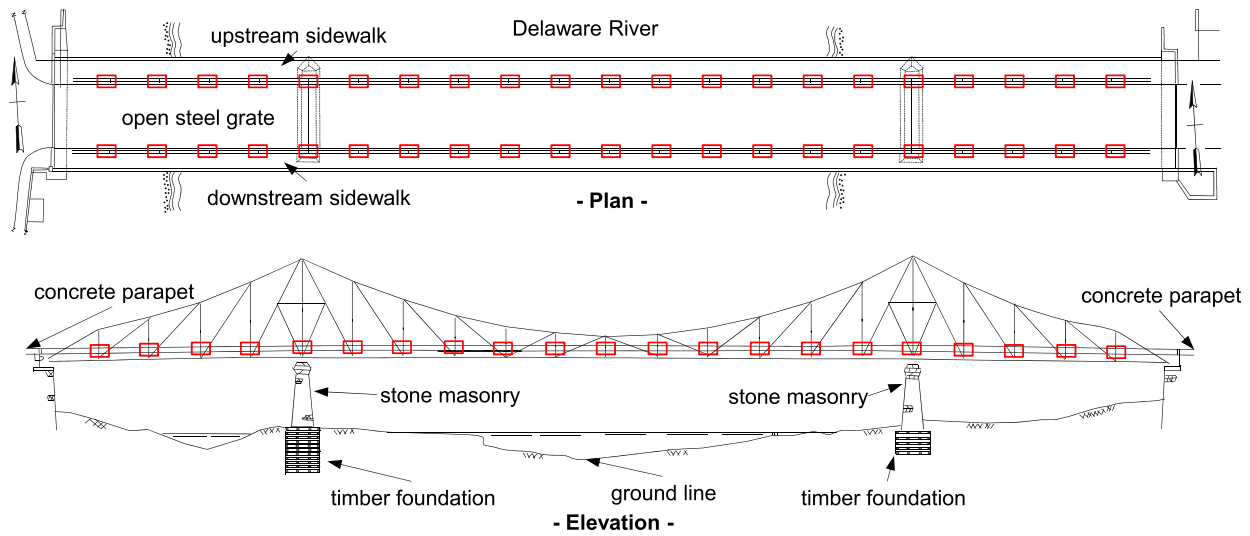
Plan and elevation views of NSB with 42 candidate sensor locations
